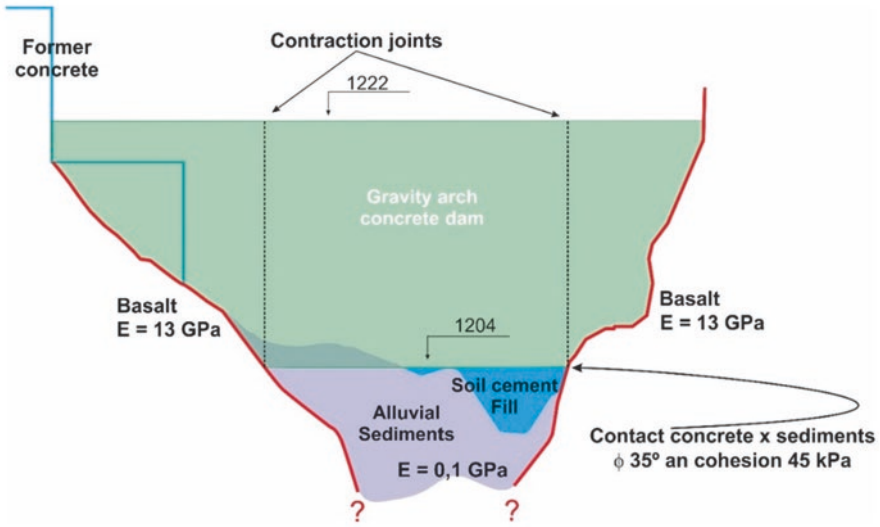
Developed section of a concrete dam with contrasting deformability foundation
